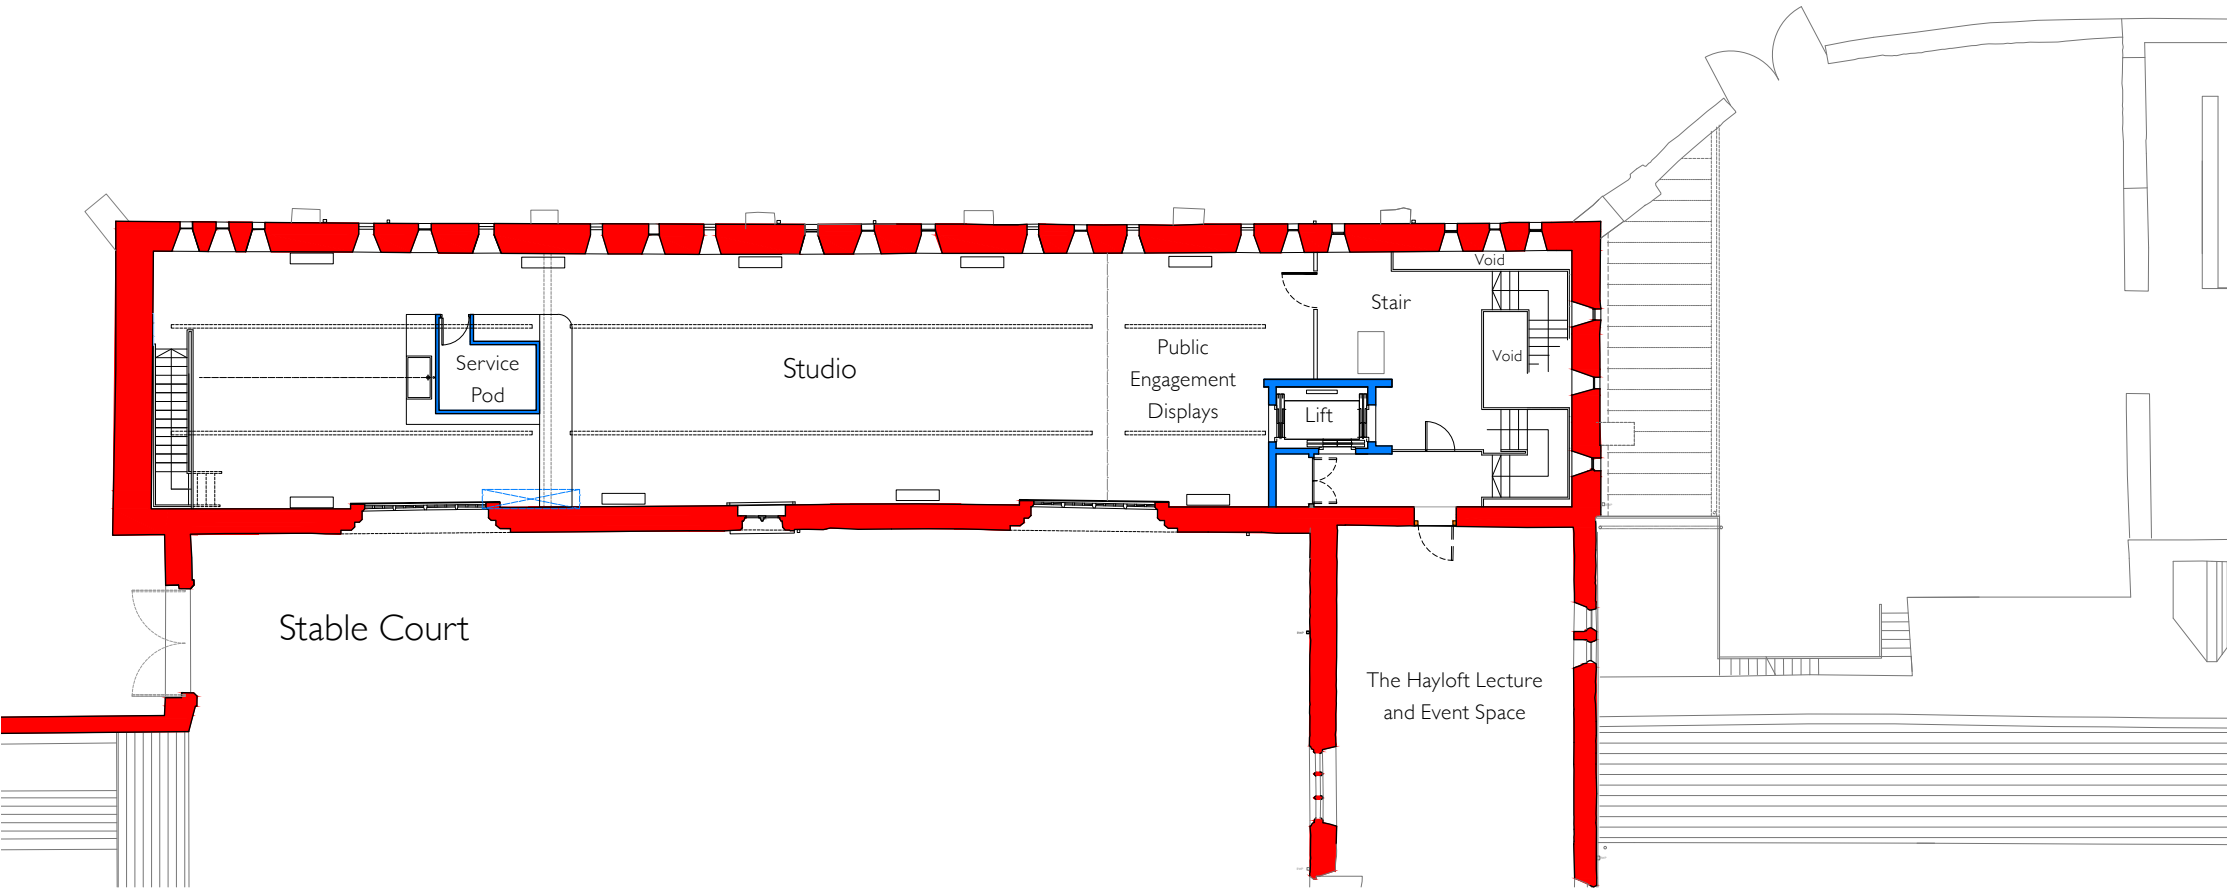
Significance Plan - Upper Floor Studio Level Plan
